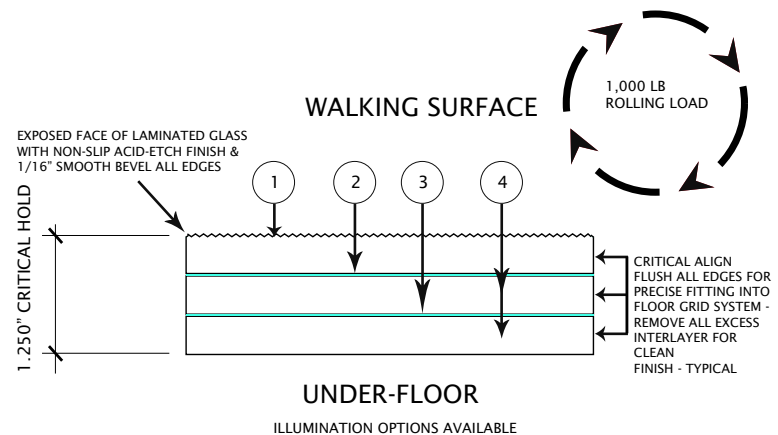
FLOOR PANEL: LAMINATED GLASS - WHITE PVB
